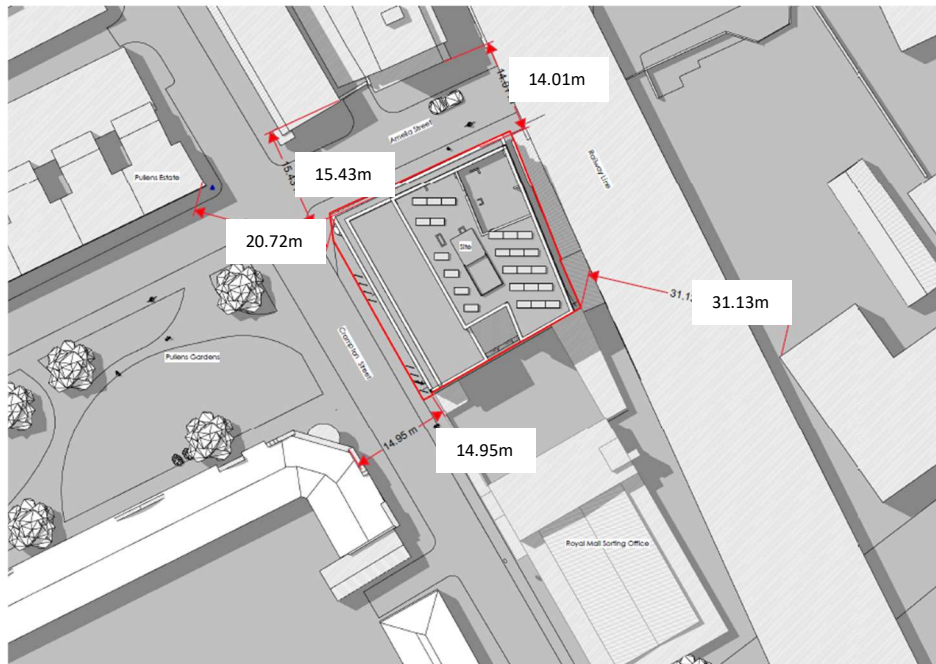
(above): Plan of the proposal in context, showing the separation distances to the surrounding buildings
